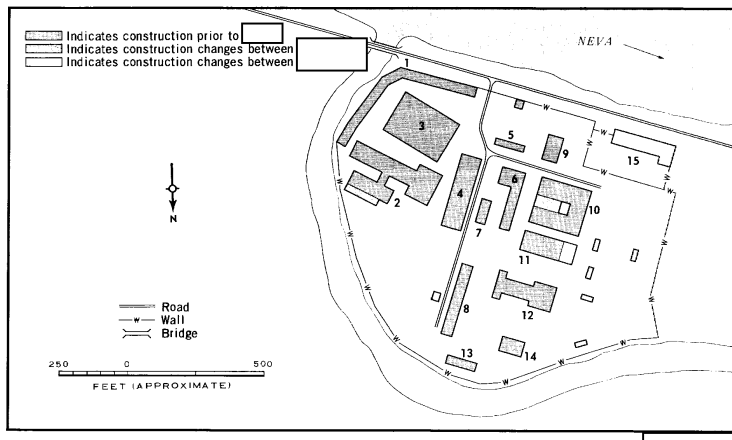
LAYOUT OF LENINGRAD AIRFRAME PLANT 272.
